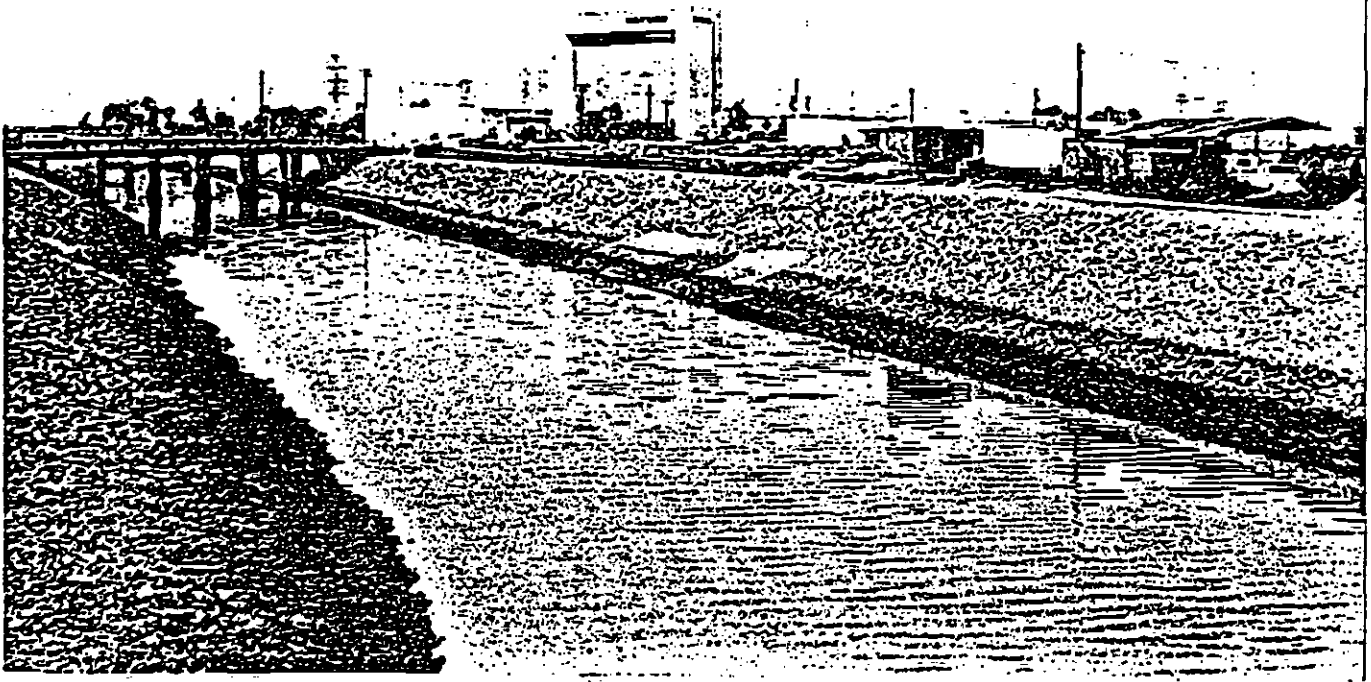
PHOTO E - LOOKING NORTH ALONG DOMINGUEZ CHANNEL TOWARD FIGUEROA STREET BRIDGE.
